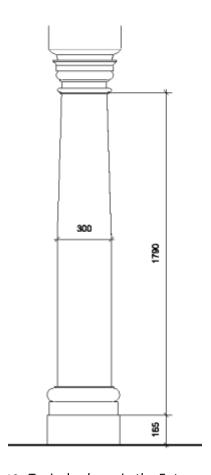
Typical column in the Entrance Hall/NCOP link corridor
